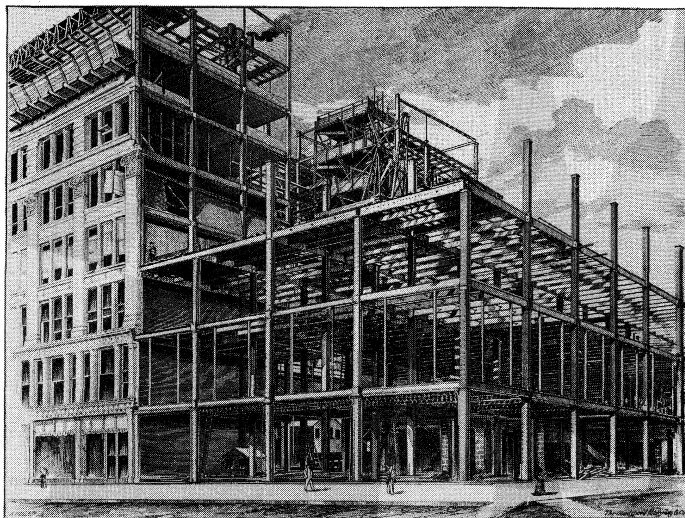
Structural elements of a steel-frame high-rise building under construction, the Fair Store, Chicago, 1892 (demolished 1984), from *Industrial Chicago*, 1891.
